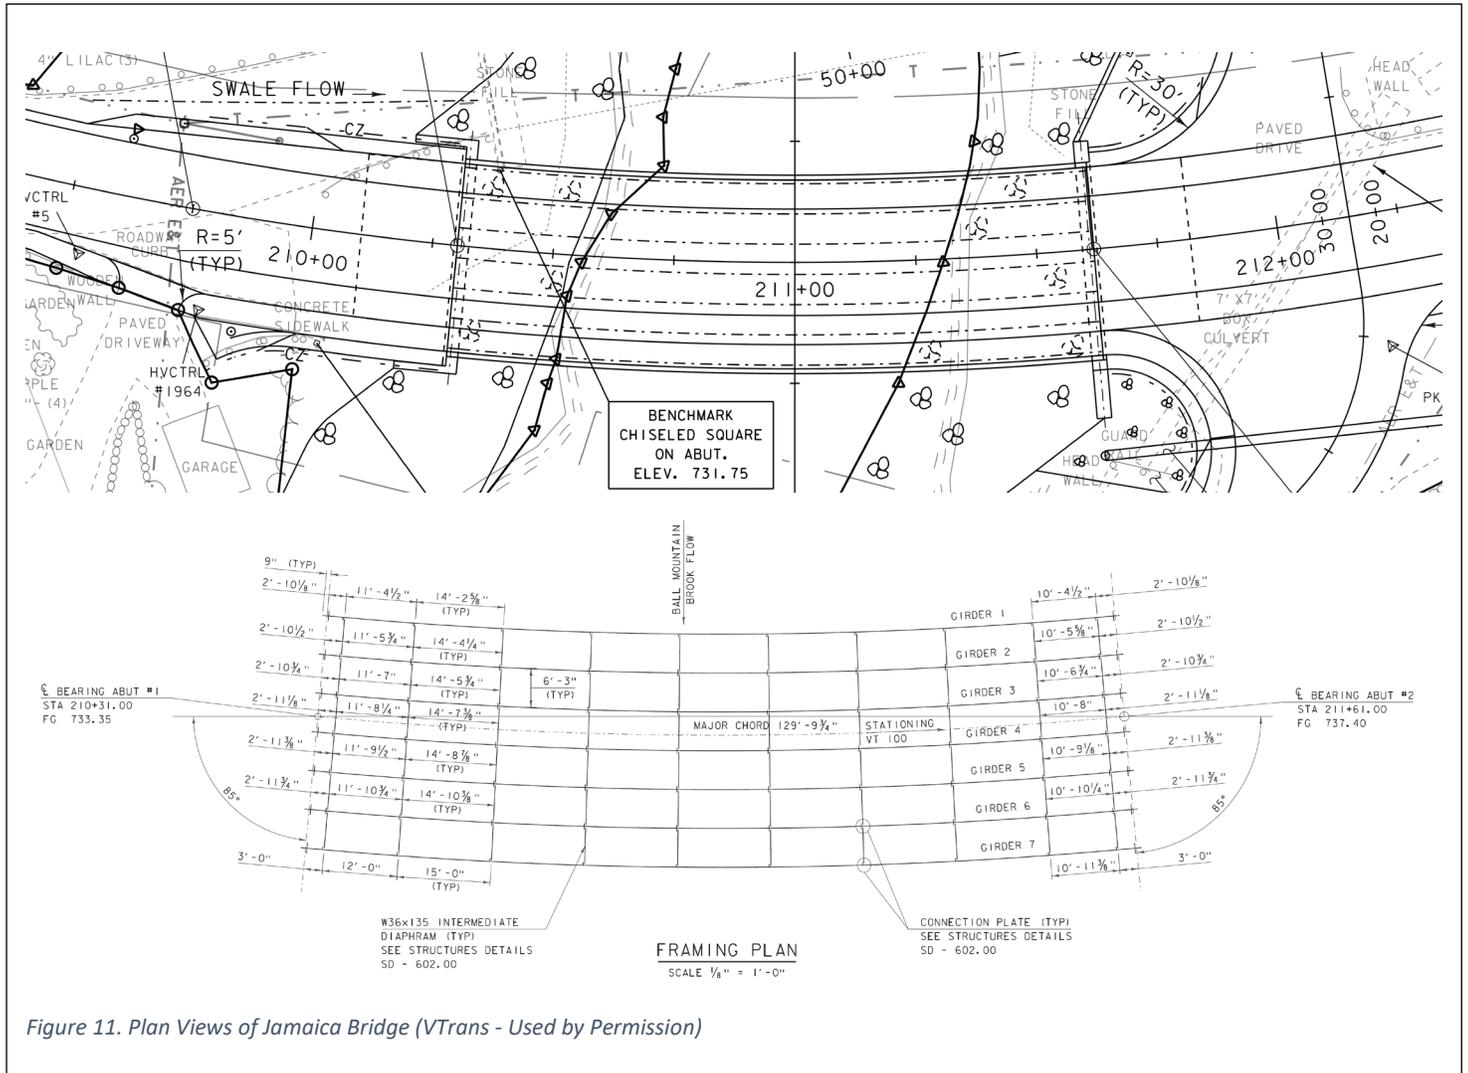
Plan Views of Jamaica Bridge (VTrans - Used by Permission)
